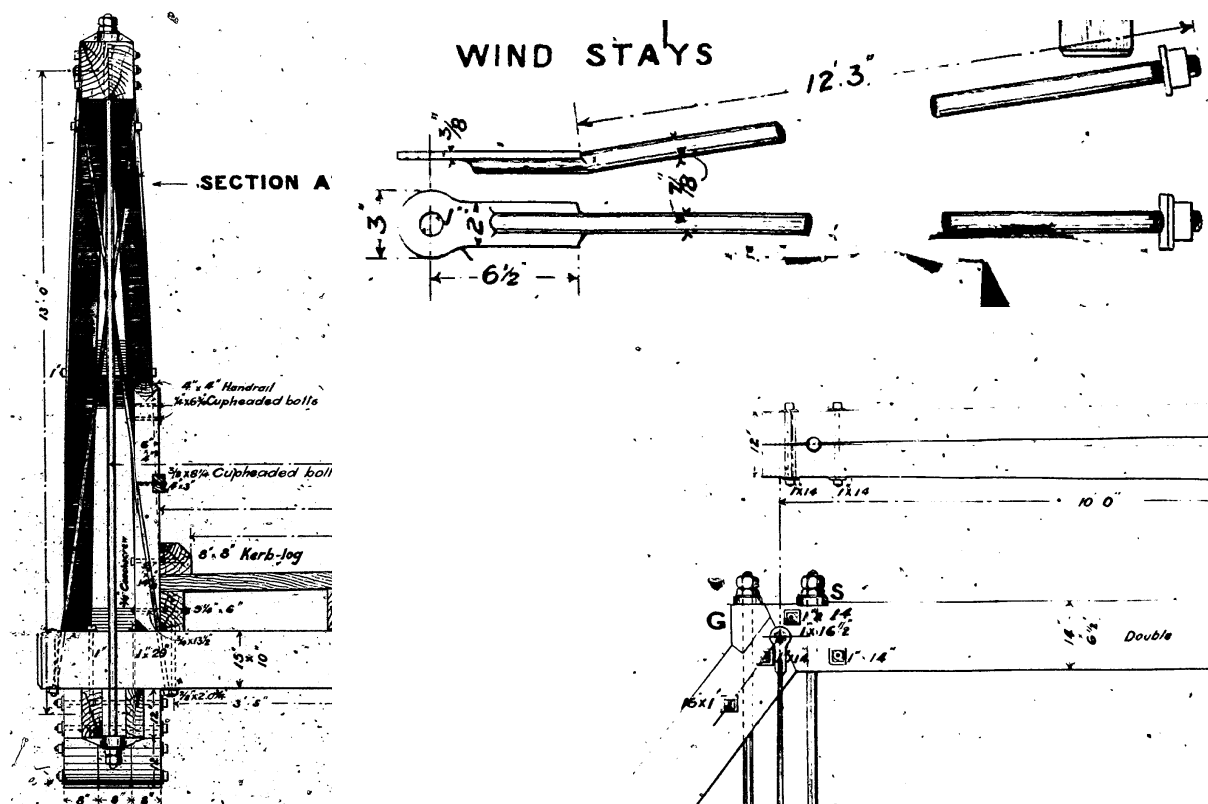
Original Detailing of Wind Stays and no Sway Bracing on Allan Trusses
